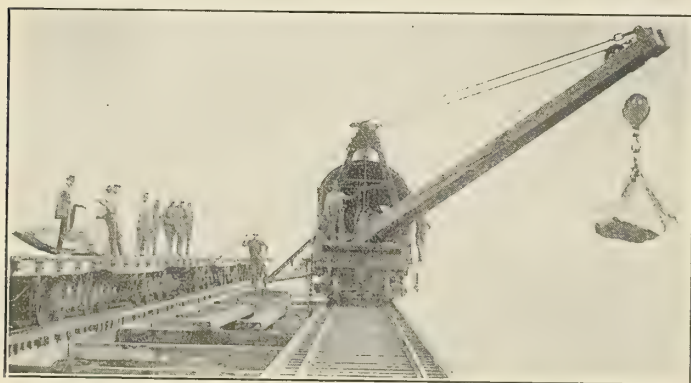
HANDLING THE STONE ON THE CONSTRUCTION PIER.
